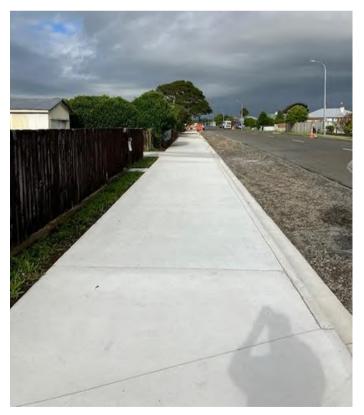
Replacement of the footpath on Fenton St to provide a shared use walkway/cycleway.
